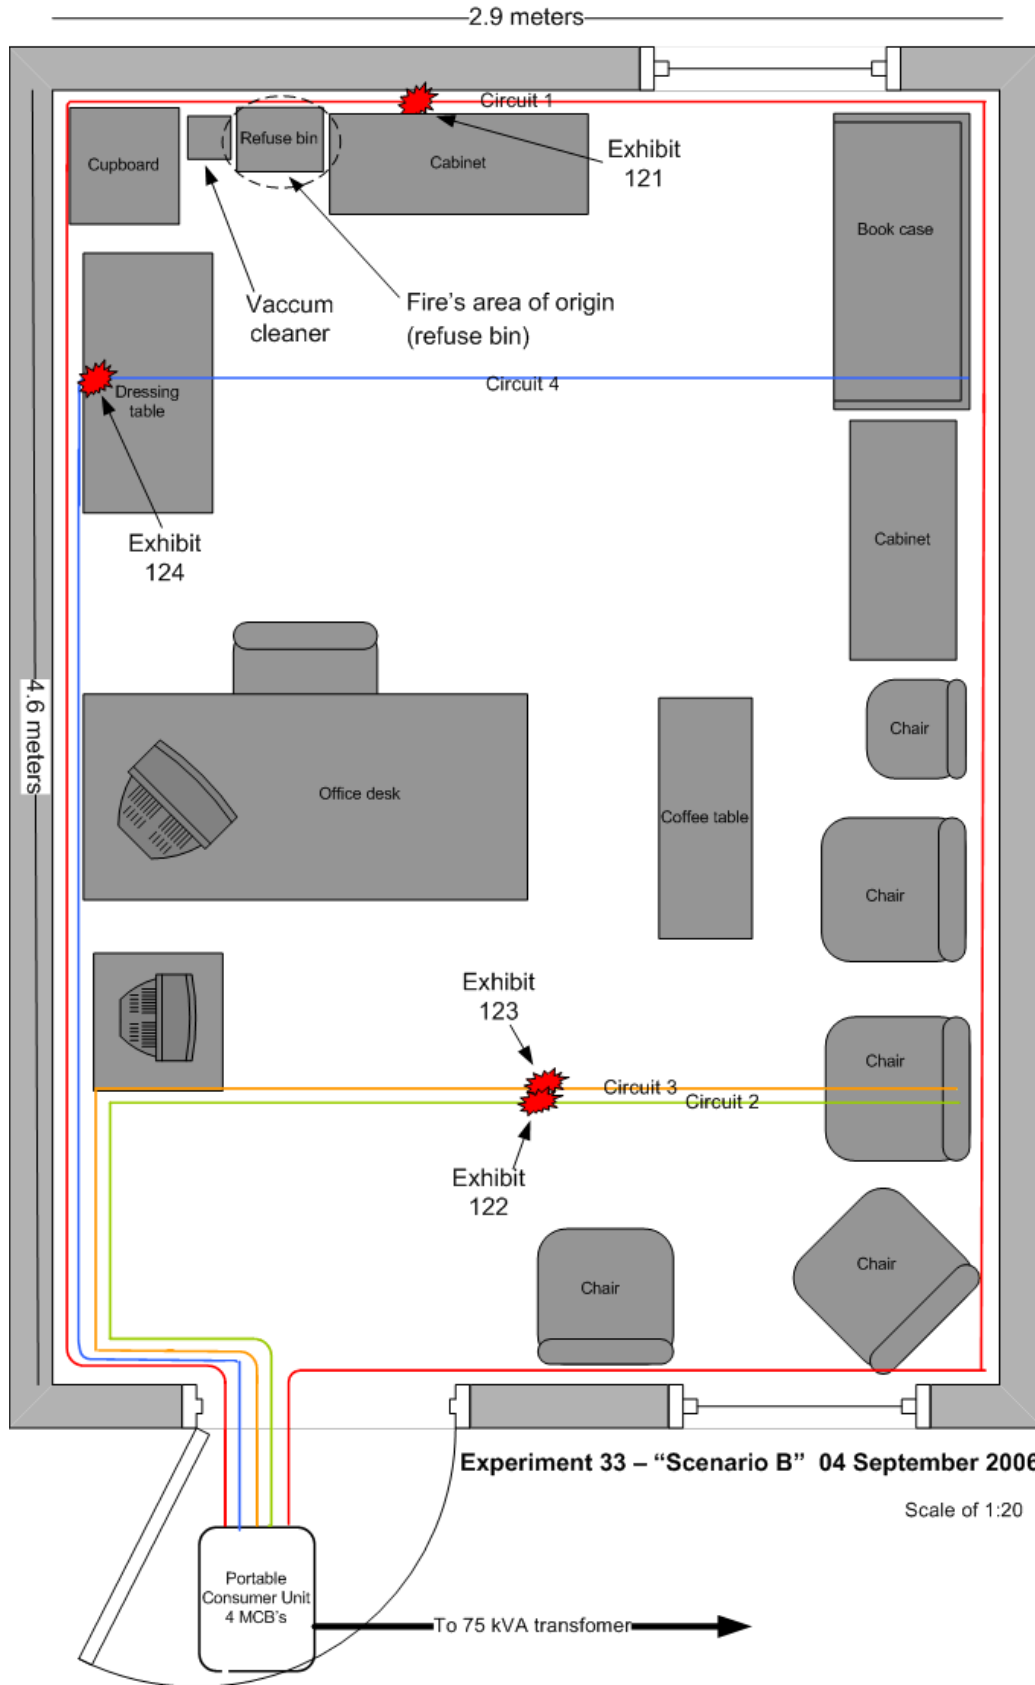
plan of experiment 33 detailing the compartment layout and electrical circuit routes.
